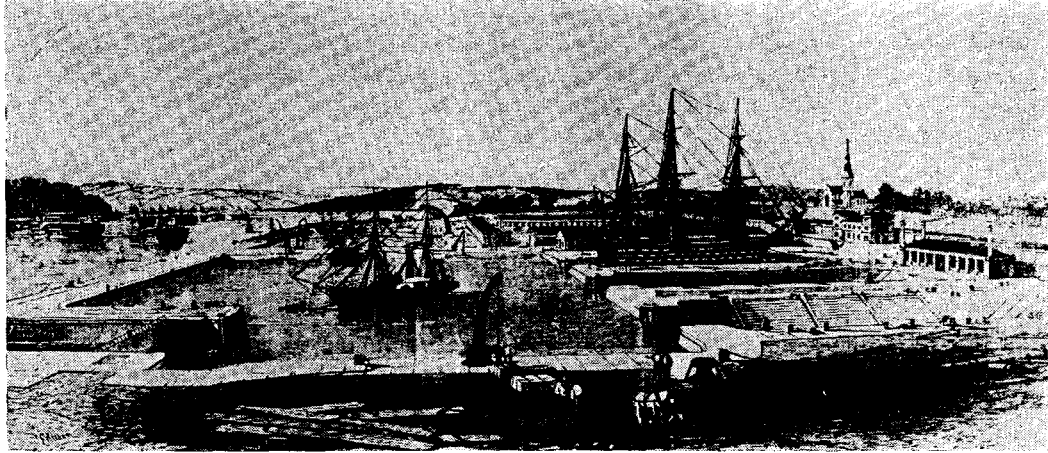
HER MAJESTY'S NEW STEAM YARD AT KEYHAM IN 1853
